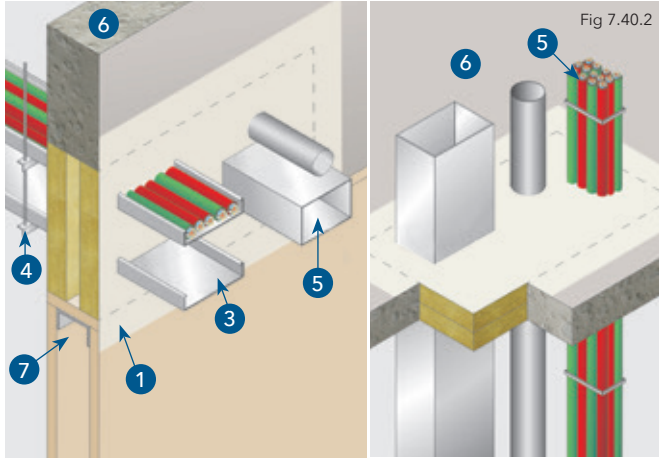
Solid Wall - Promat PROMASEAL® Fire Barrier System may be mounted in brickwork, concrete or lightweight walls to a minimum 130mm thick, provided the fire resistance is higher or equal to the installed system.
